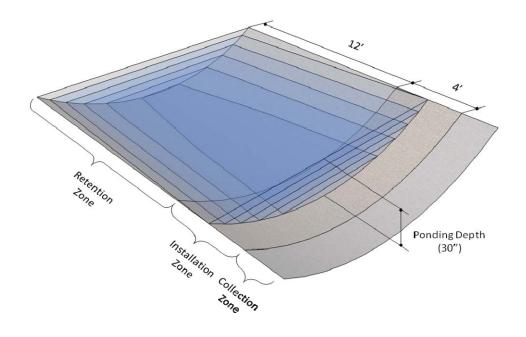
Water Ponding behind SCD Set Up in the Center of Installation Zone.
